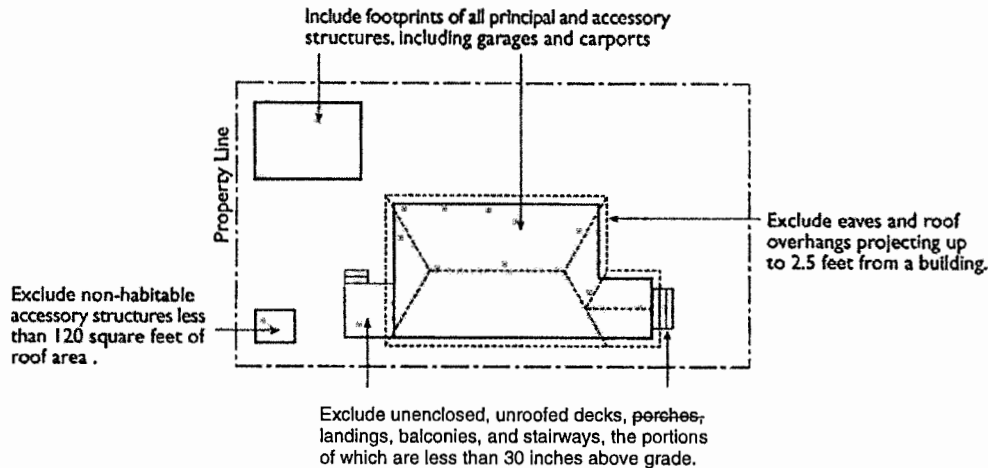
J: DETERMINING LOT BUILDING COVERAGE
